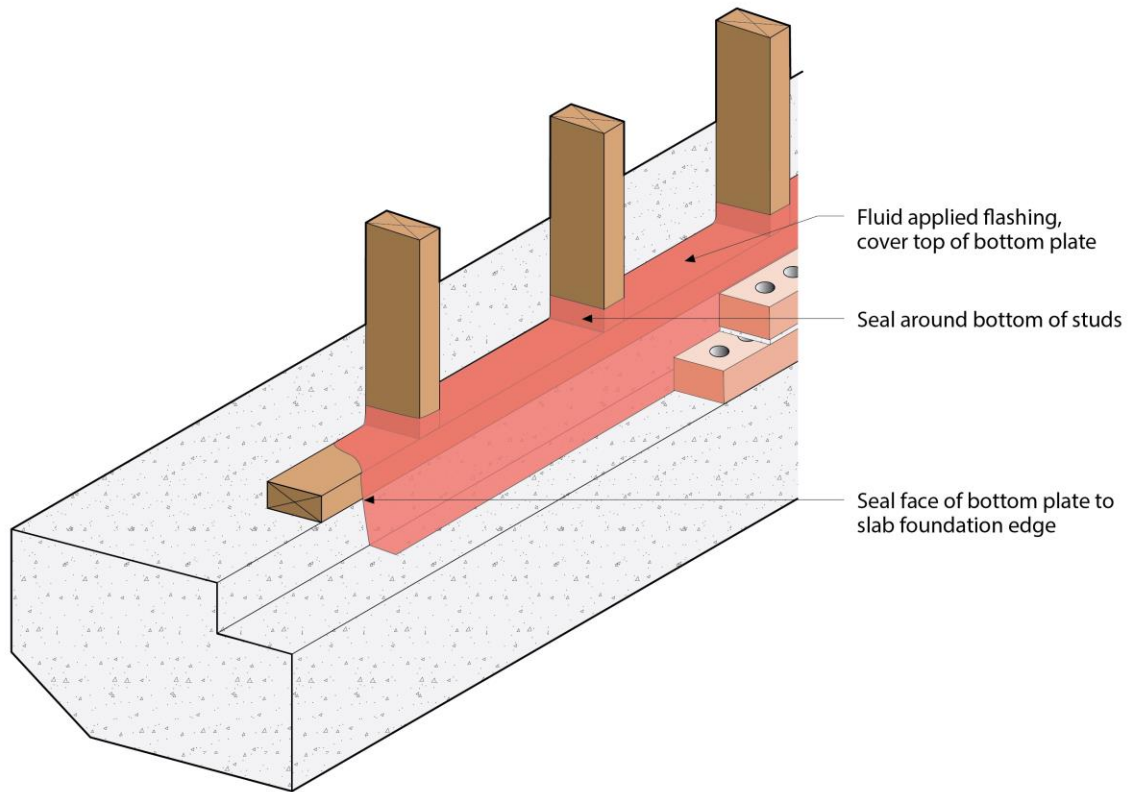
Fluid Applied Flashing - The intent is to turn the bottom plate of the existing frame wall into a pan flashing. The fluid applied flashing should completely cover the top of the bottom plate and seal upwards around each stud. The fluid applied flashing needs to extend down the exterior face of the bottom plate and seal to the seat in the concrete supporting the brick veneer.
